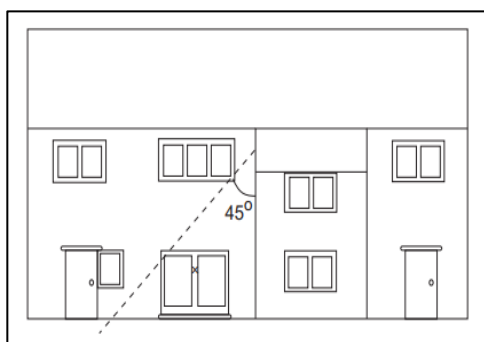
Stage 2 Elevation - 45° guideline assessment. In this example the affected patio door is within the 45° angle on both plan (fig 1) and elevation, so a significant reduction of light is likely.
